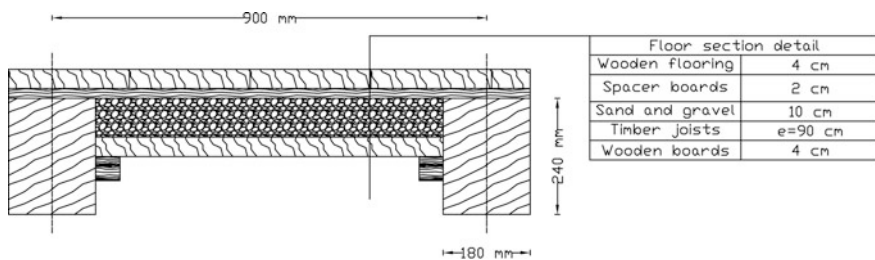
Typical cross section of old floor elements used in the numerical study in Unuk et al. [65]
